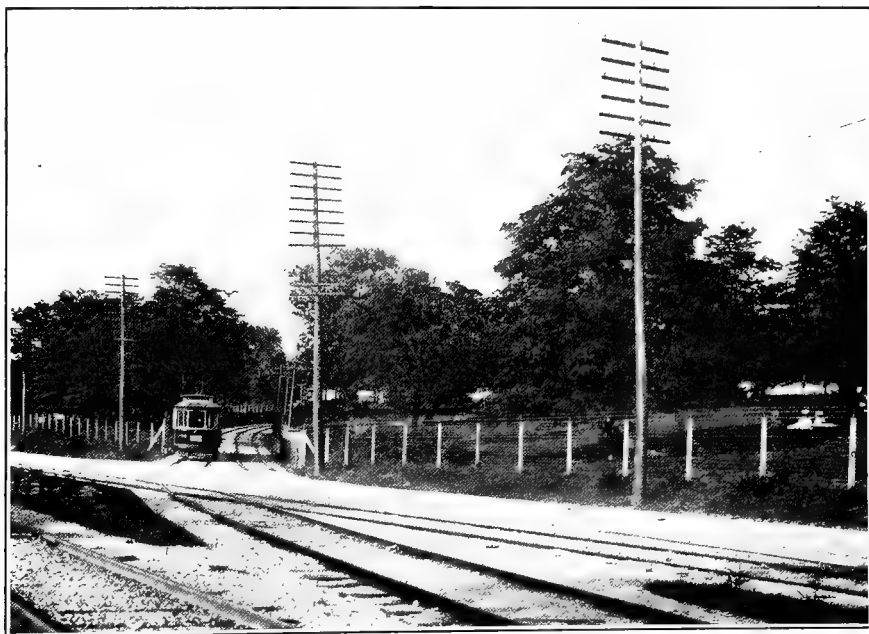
CONCRETE FENCE POSTS, DELLWOOD PARK.
